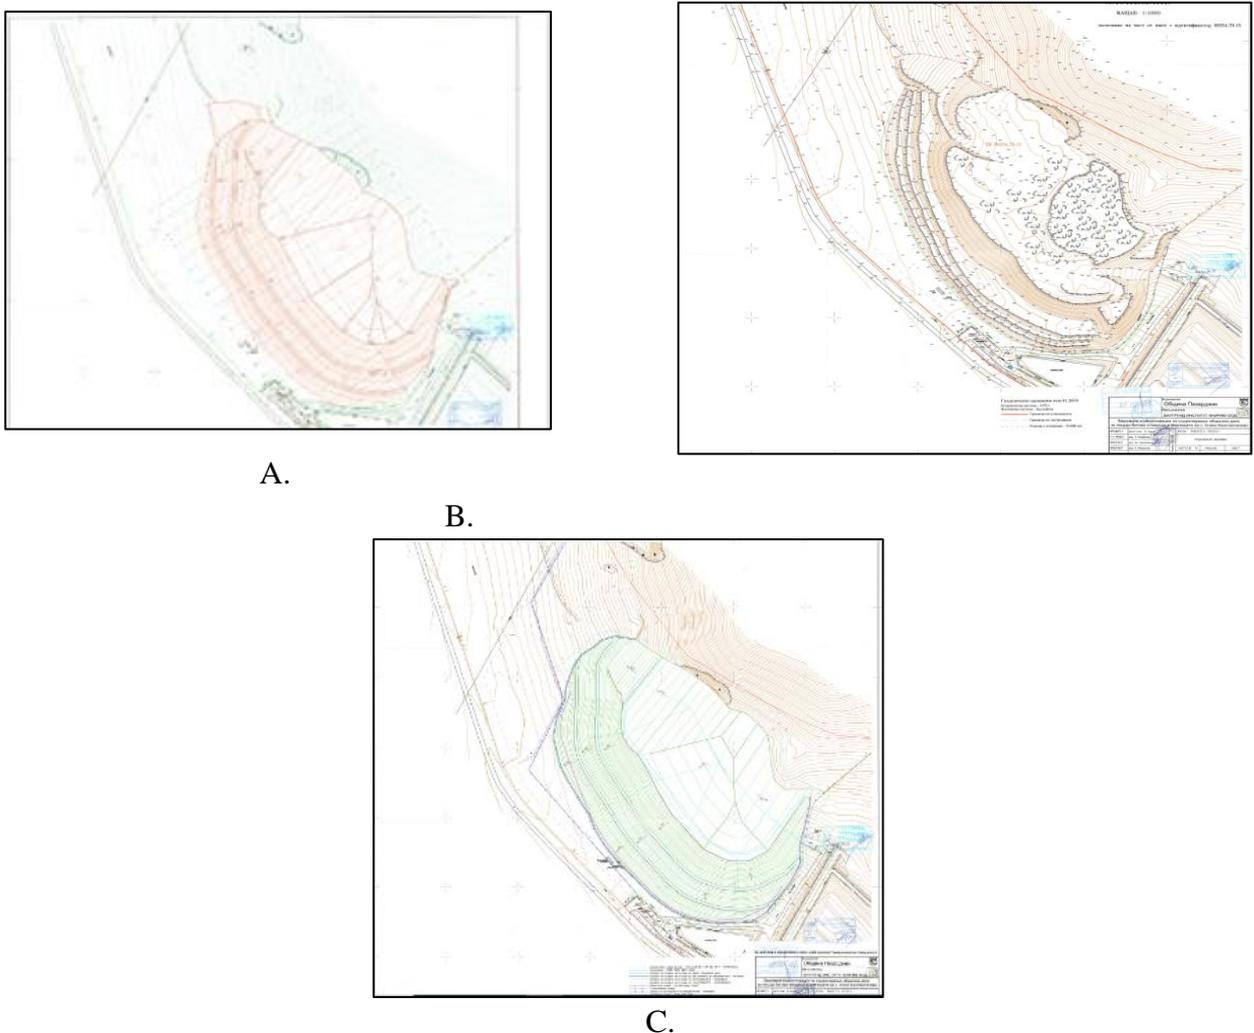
Existing old open dump in the land of Aleko Konstantinovo A. Vertical planning of the site; B. Geodetic survey; C. The general plan of the site is to be reclaimed.
